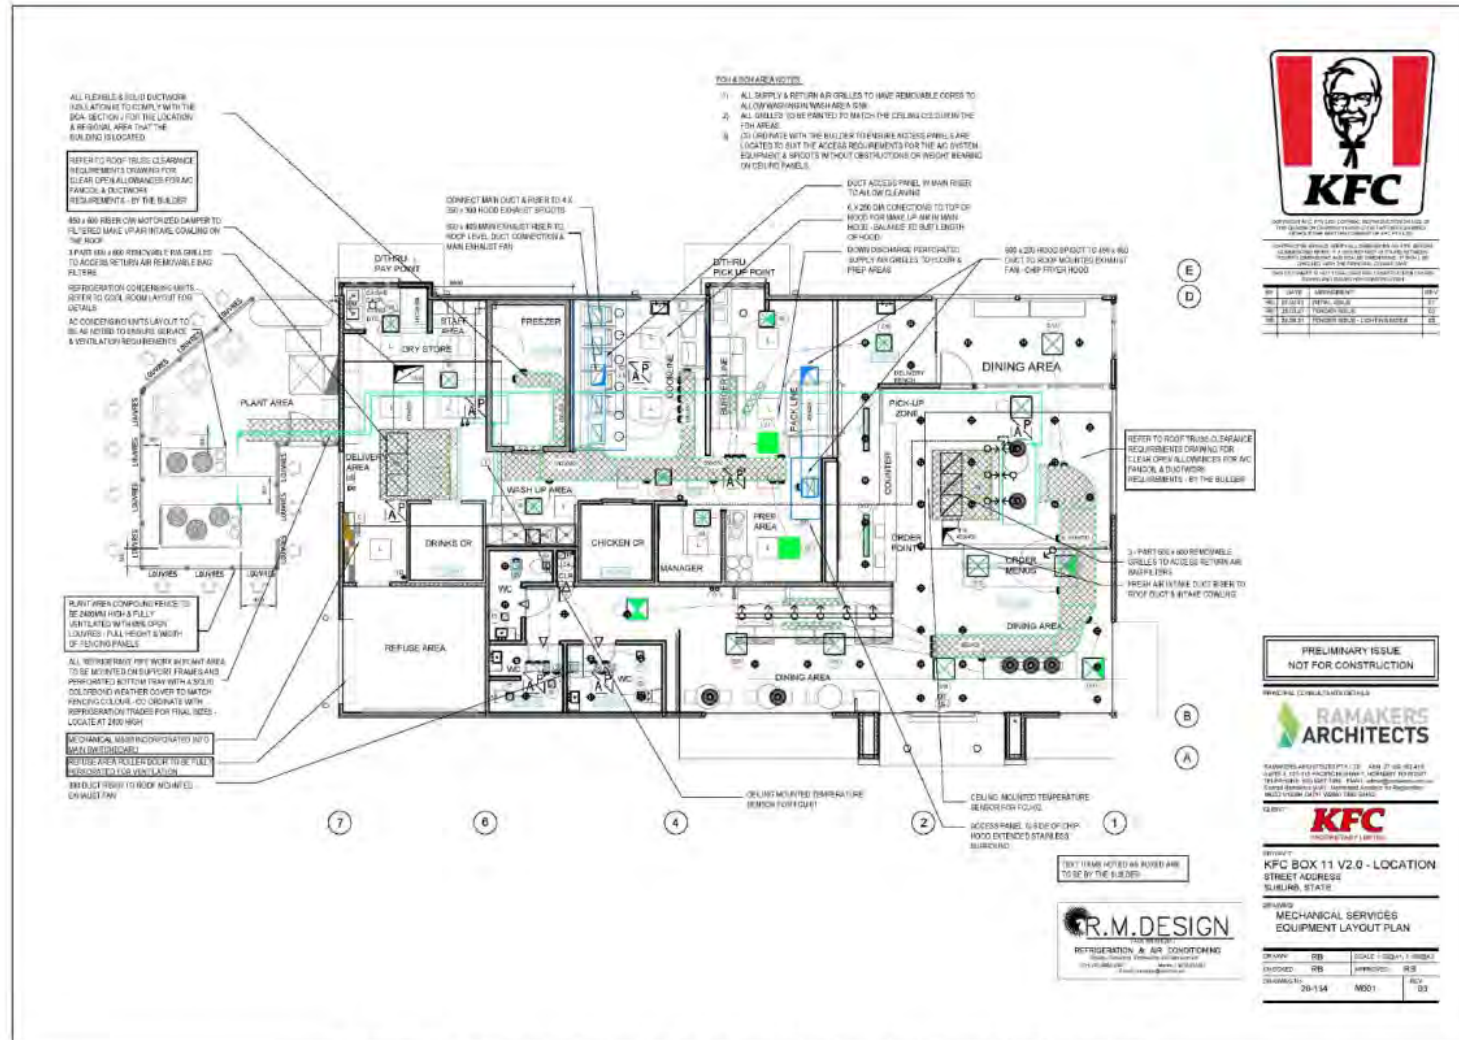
An equipment layout plan for the mechanical services at the Proposed KFC Development
